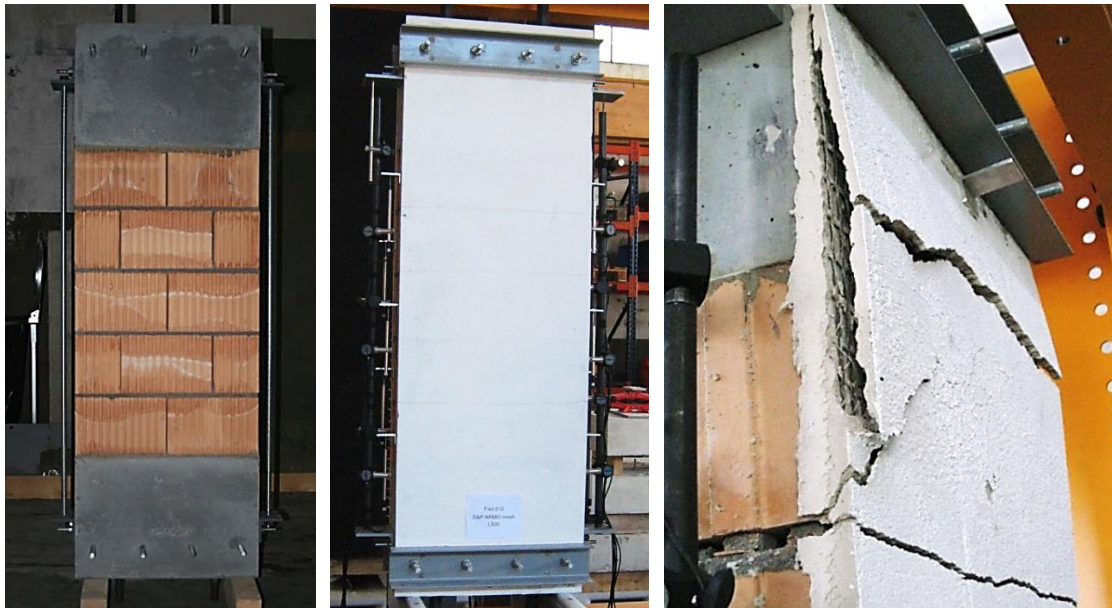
and 5b: Test set-up for static tensile tests on retrofitted masonry walls.
